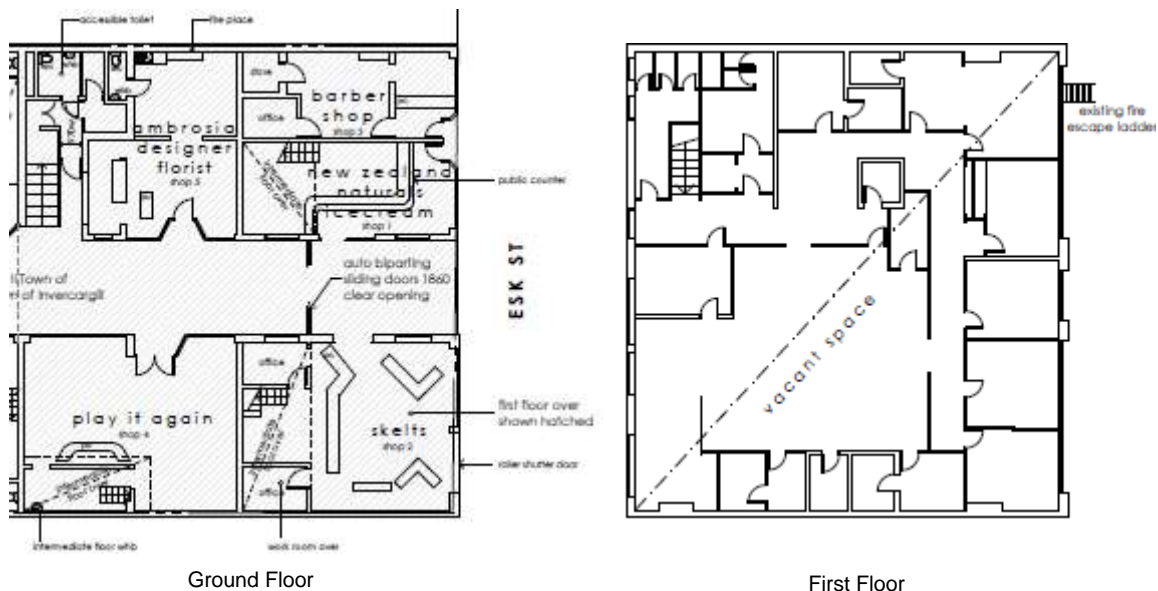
Building Floor Plans from 2010 drawing by Designbase Ltd.
